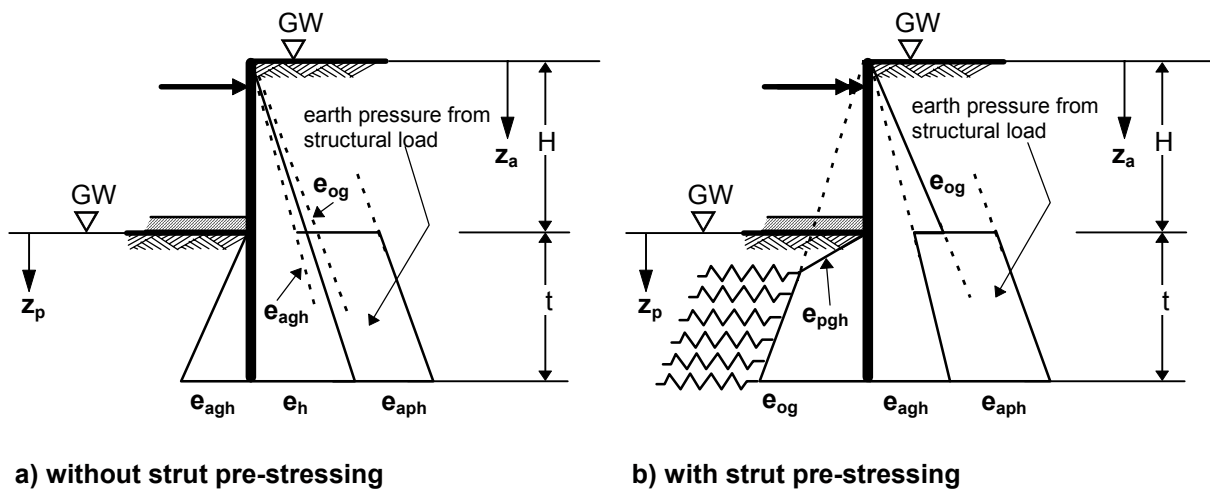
Possible load diagram for a flexible wall supported by a strut at the top and by a bottom slab installed by means of jet pile column or soilcrete
